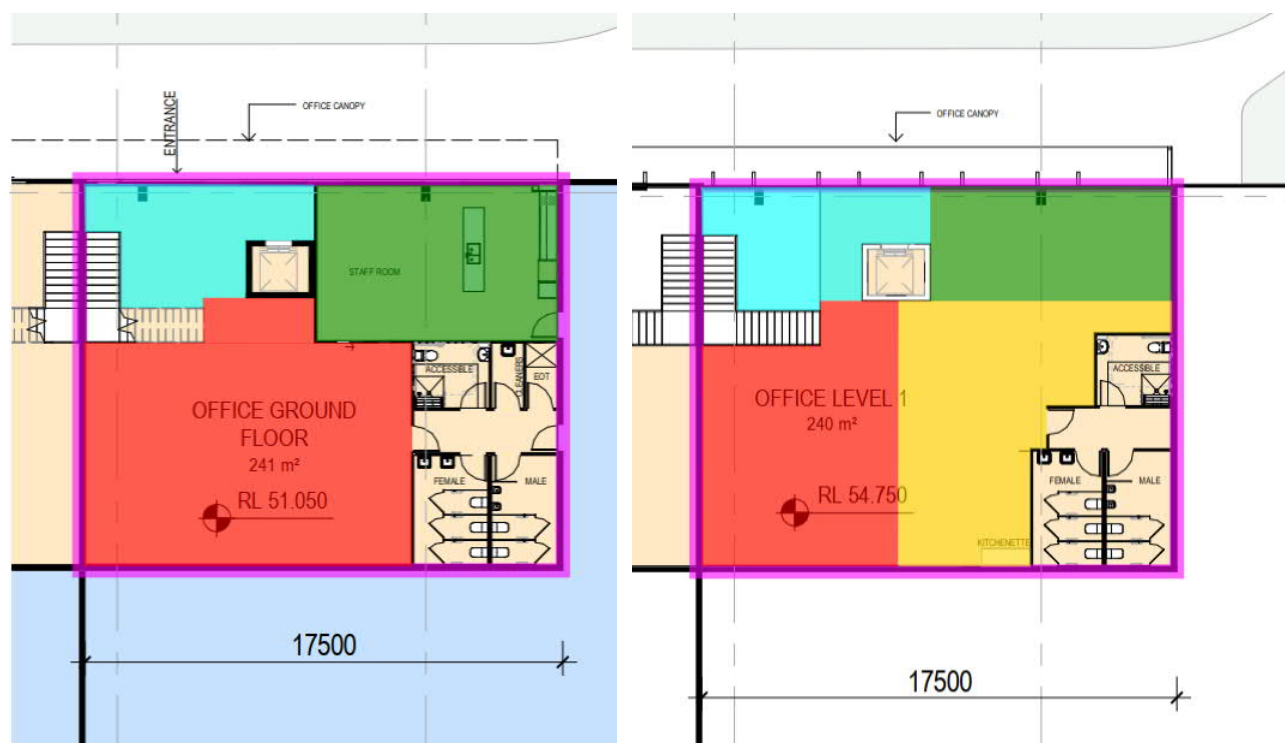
HVAC zones and thermal envelope for 3 Nursery Ave Ground Floor (Left) and First Floor (Right)
